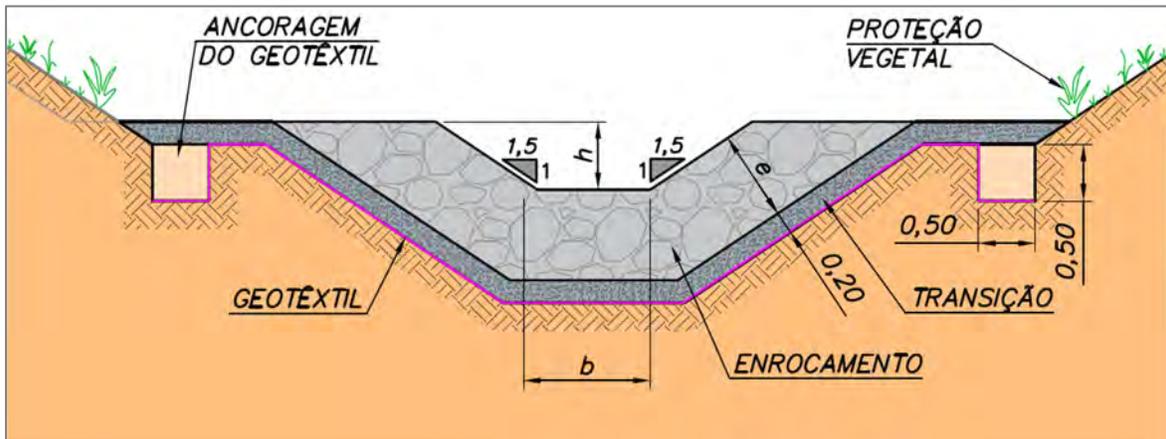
Typical Section of Hydraulic Devices Consisting of a Trapezoidal Channel with Rockfill Lining
